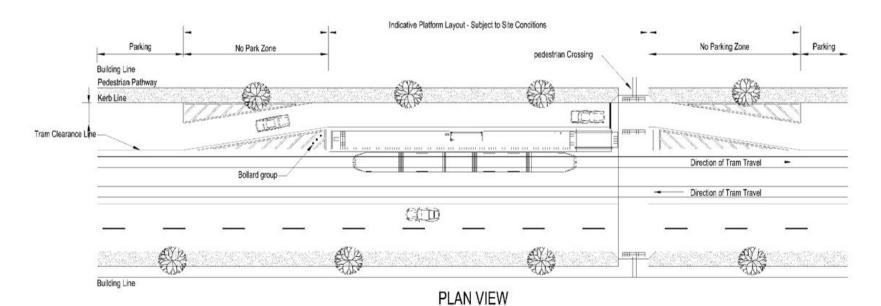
TYPE P1 — Typical Arrangement for Single Face Platform
